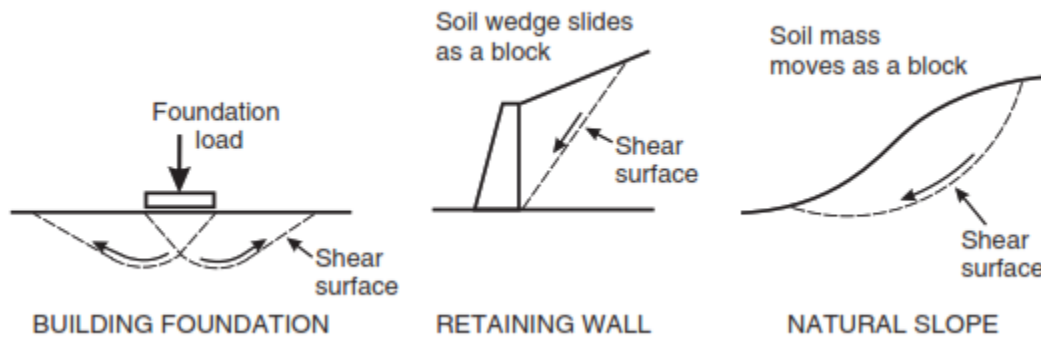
3: Modes of Failure for Foundations, Retaining walls, and Soil Slopes (Wesley, 2010)
